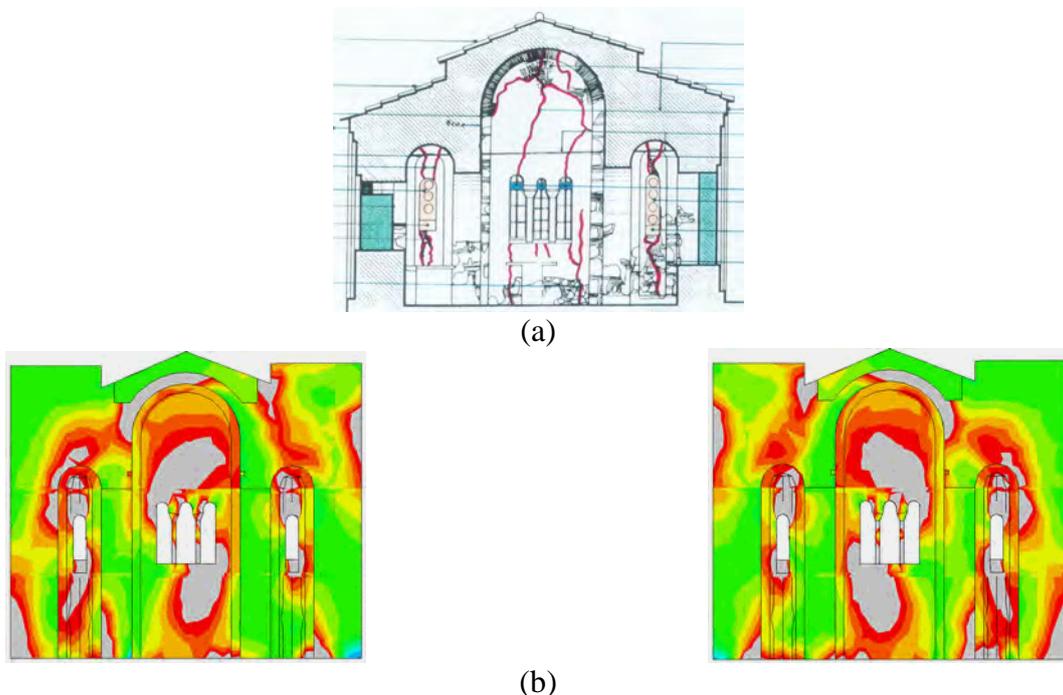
E wall (sanctum): (a) existing crack pattern; (b) principal tensile stresses at time steps 240 and 284.
